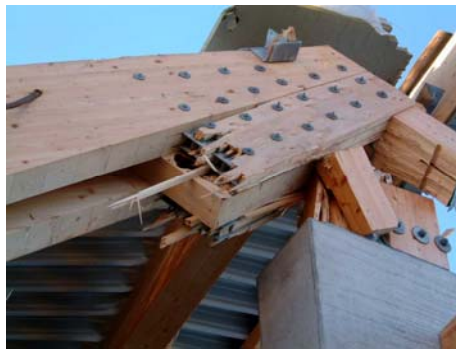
Rupture at the critical cross section in the corner connection. Note the dowels and steel plates.
